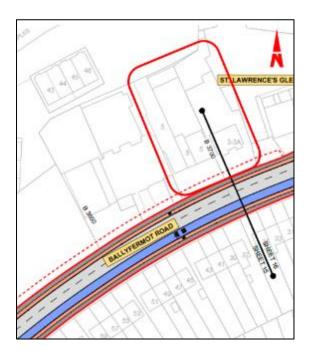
Proposed new Layout at 5 Ballyfermot Road
